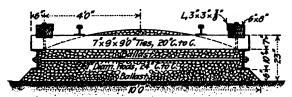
Proposed Track Construction with the Ties Supported by Longitudinal I-Beams.
